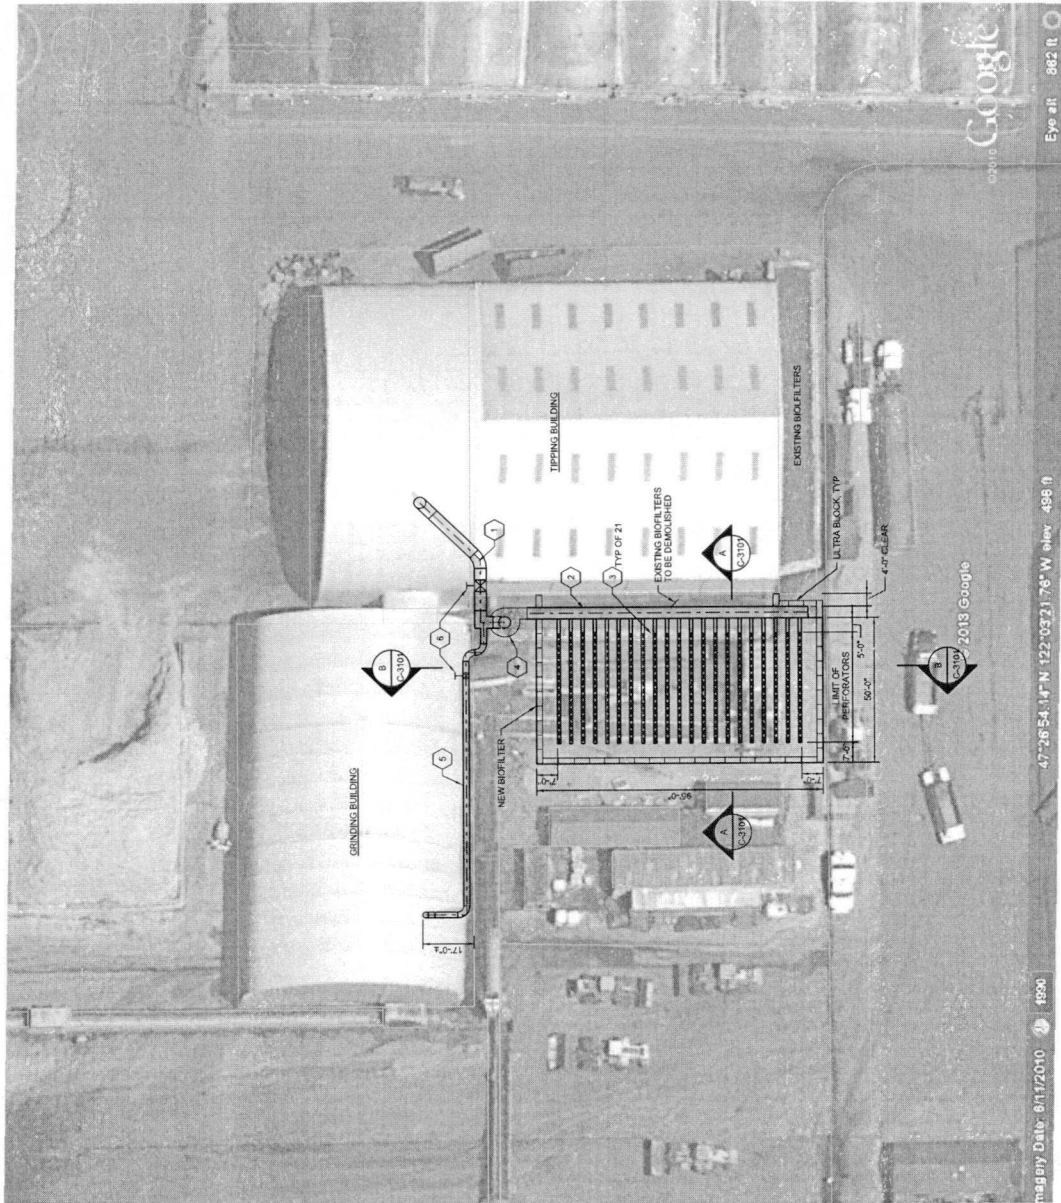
shows the site layout plan showing the collection ducting locations. A 24" diameter HDPE collection duct will be installed along the south wall of the grinding building and a collection point installed approximately one quarter of the width of the building and three quarters down the length of the building from the grinder end. An open
